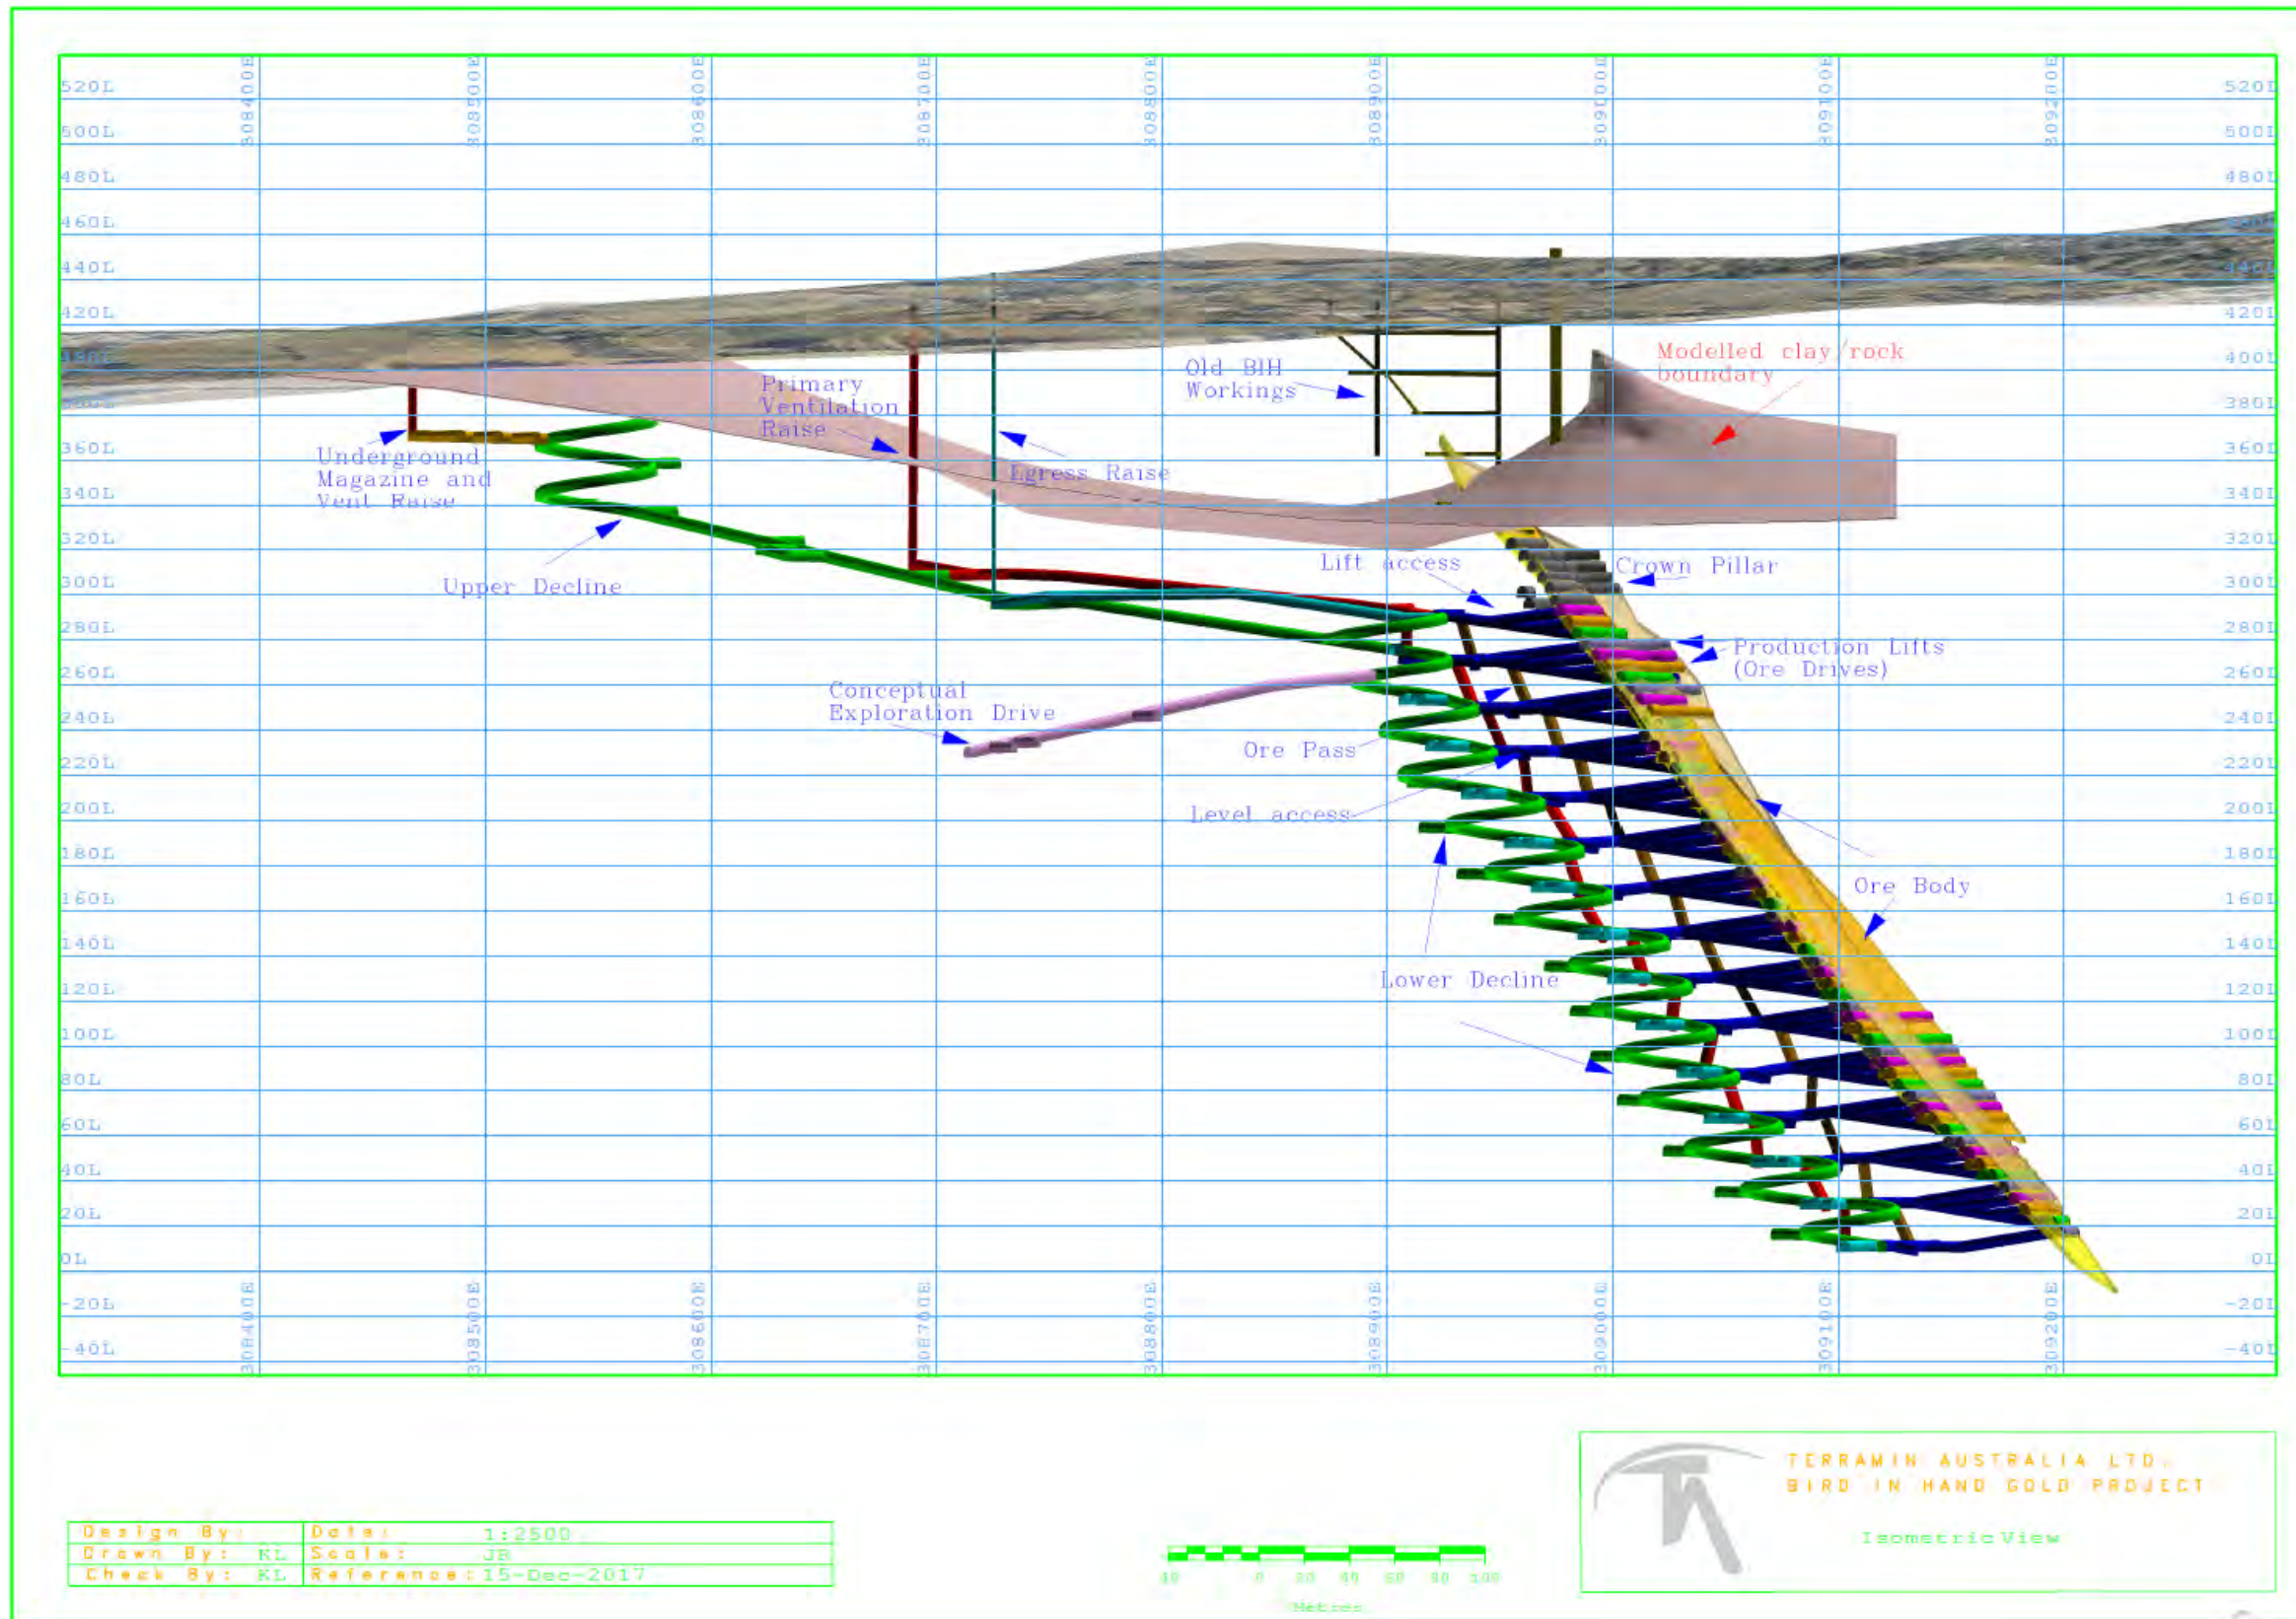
| ISOMETRIC VIEW OF THE PROPOSED UNDERGROUND BIH MINE SHOWING THE MODELLED CLAY/ROCK SURFACE AS MODELLED BY MINING ONE, AS WELL AS THE RELATIVE LOCATION OF THE OLD BIH WORKINGS
